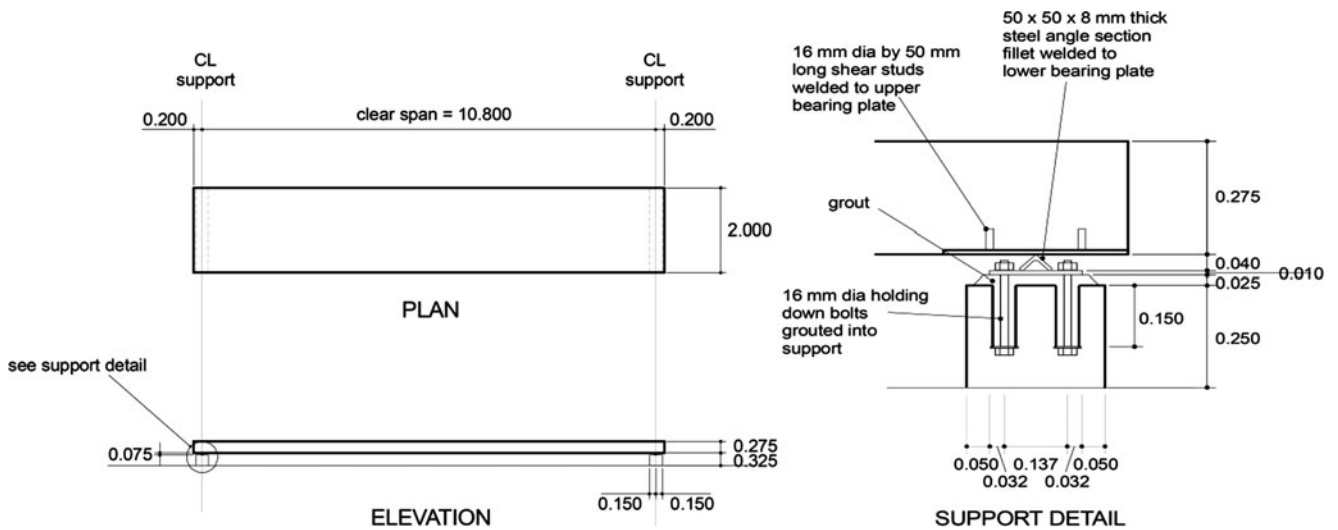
Plan of slab strip and a typical support detail [4]
